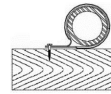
INSTALLATION INSTRUCTIONS
